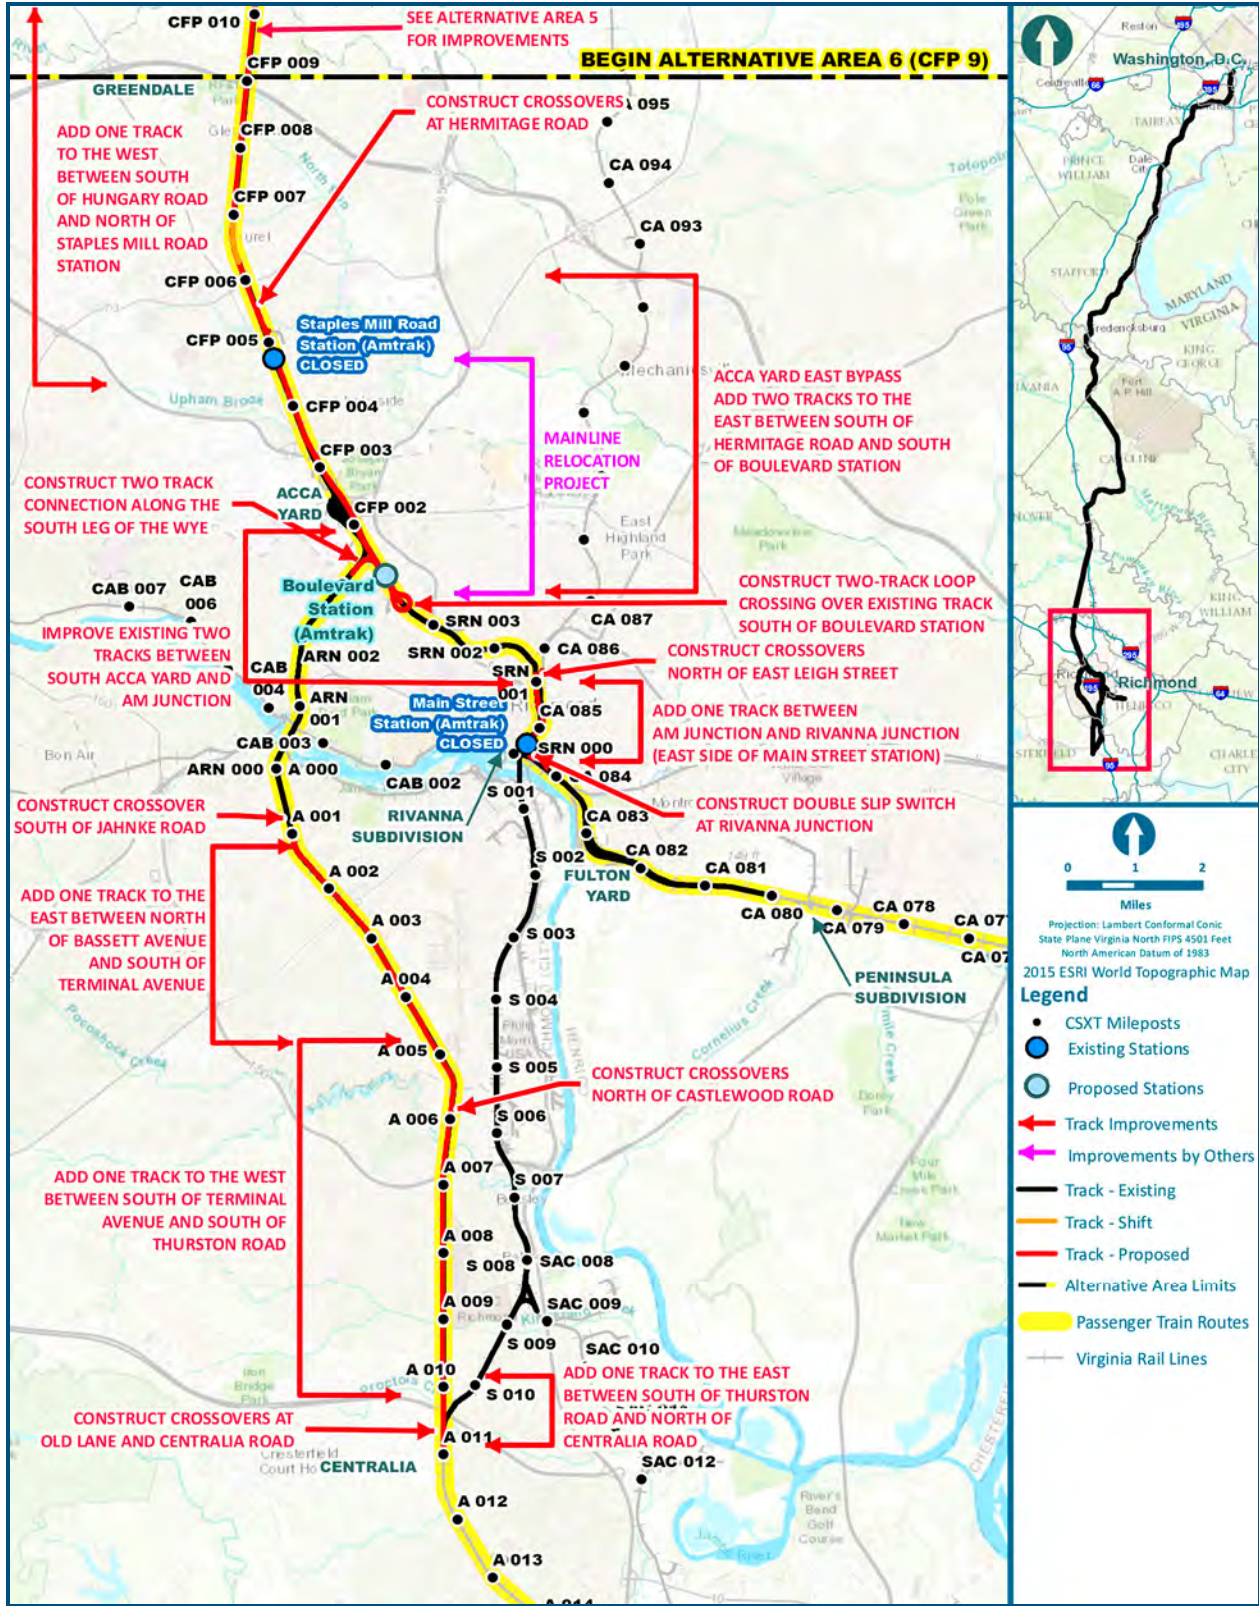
Build Alternative 6B-A-Line – Boulevard Station Only, A-Line
